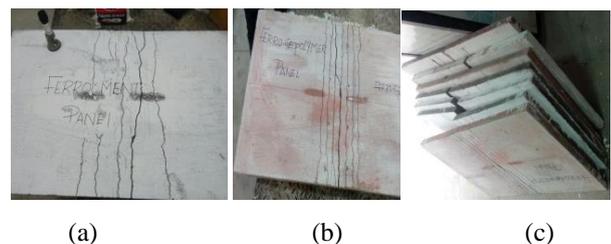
(a) cracking of ferrocement panel (b) cracking of ferro-gopolymer panel specimens after testing
